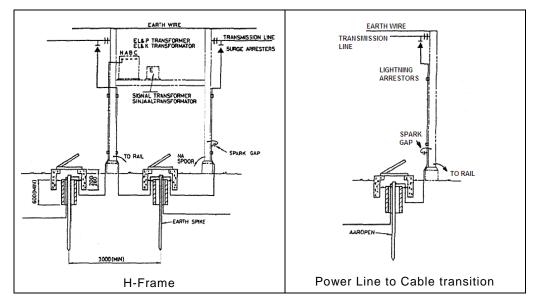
Typical H Frame stepdown point earthing arrangement
